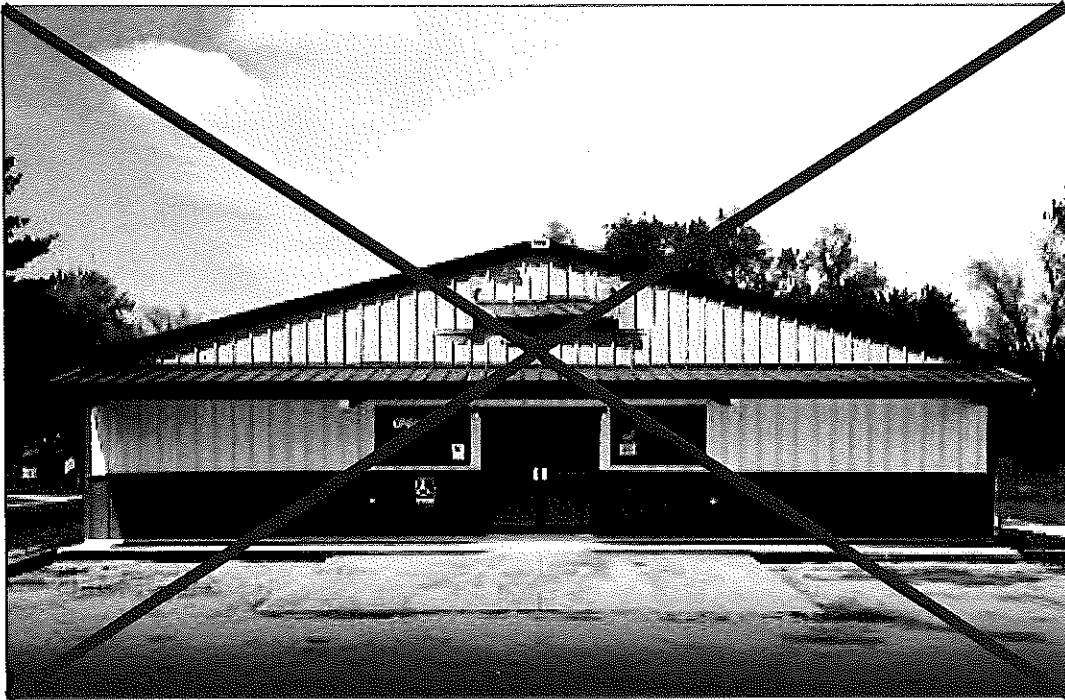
COMMERCIAL BUILDING & SITE DESIGN EXAMPLES
